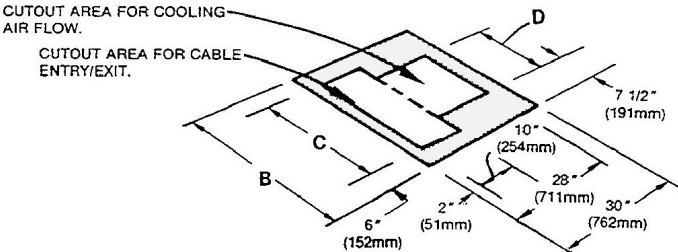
Typical cabinet and floor planning dimension data, two or three panelboard unit
